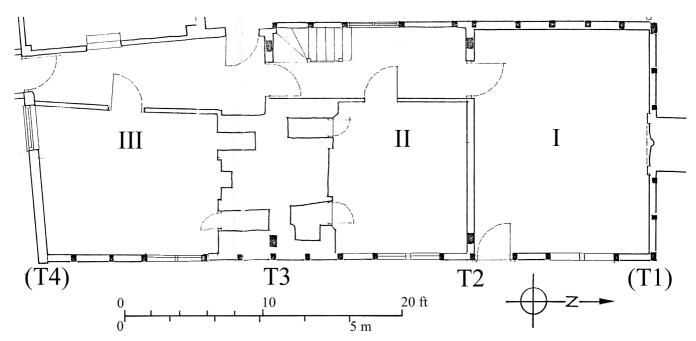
Plan, showing truss and bay numbering (from a survey and drawing by Paul Woodfield).
